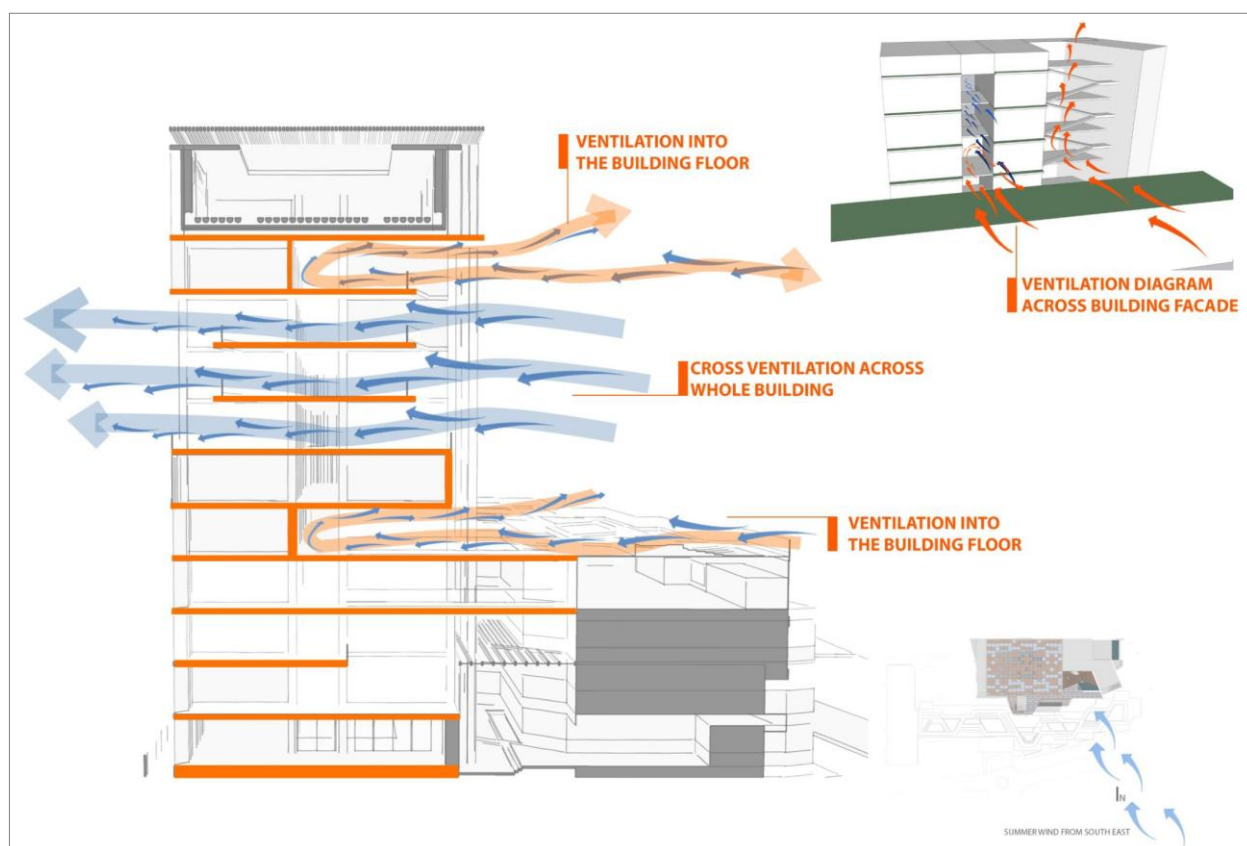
Cross ventilation system proposed at the IBA Annex building
